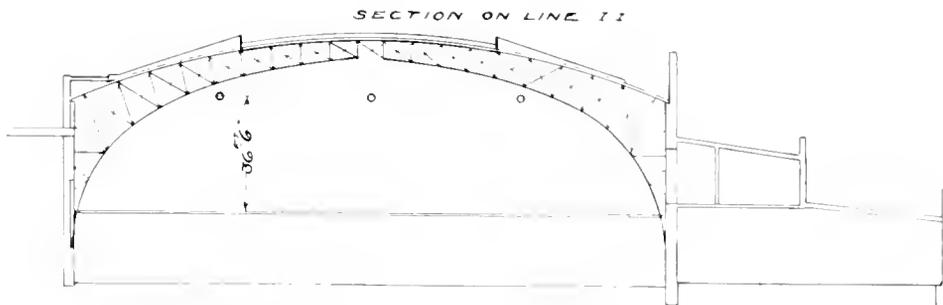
b. Sectional Elevation Showing Location of Lamps in Riding Hall at the West Point Military Academy
